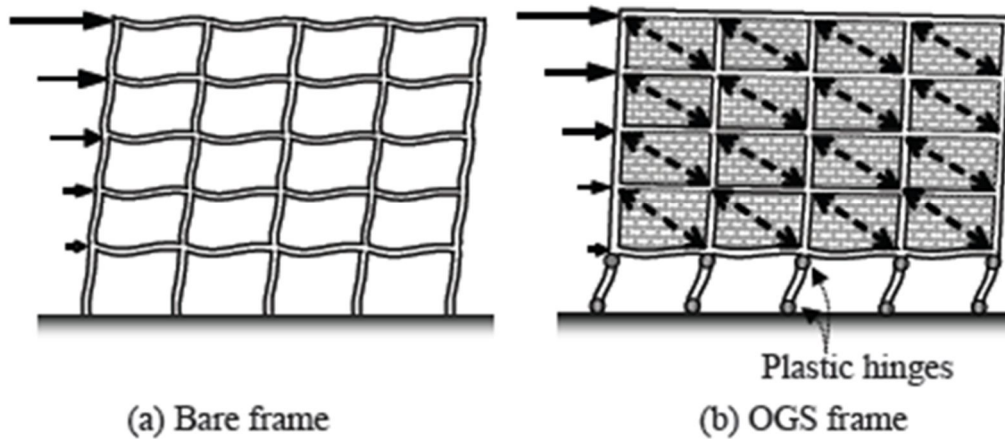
showing difference in behavior between bare, infill and OGS building frame
